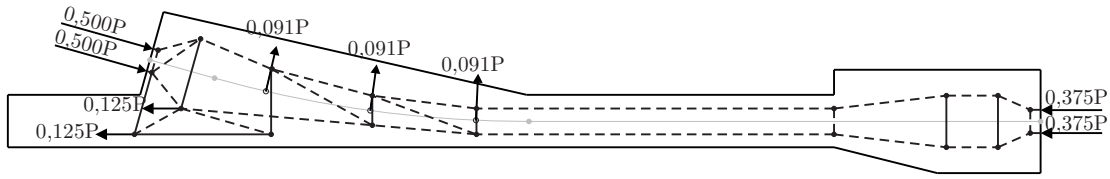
Strut and tie model - Section B-B (tendon B)
